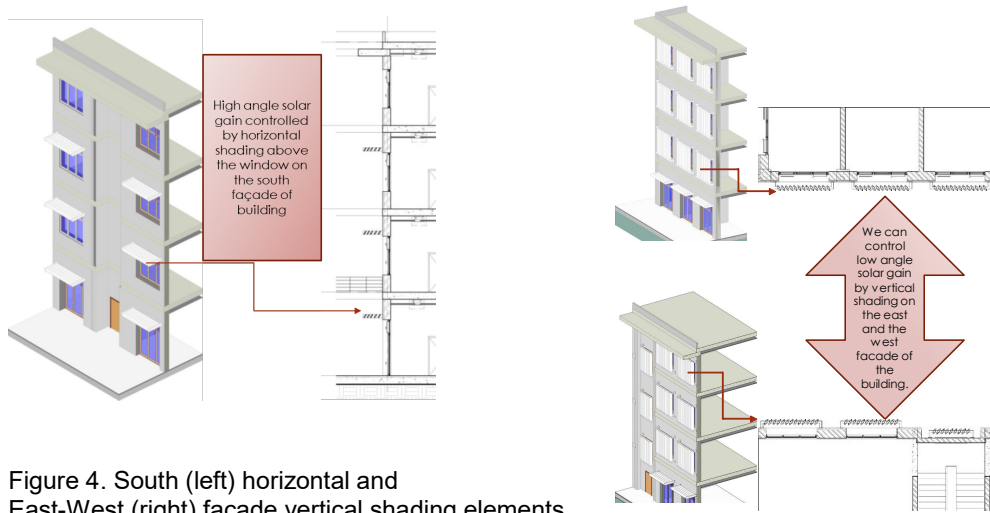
South (left) horizontal and East-West (right) façade vertical shading elements
